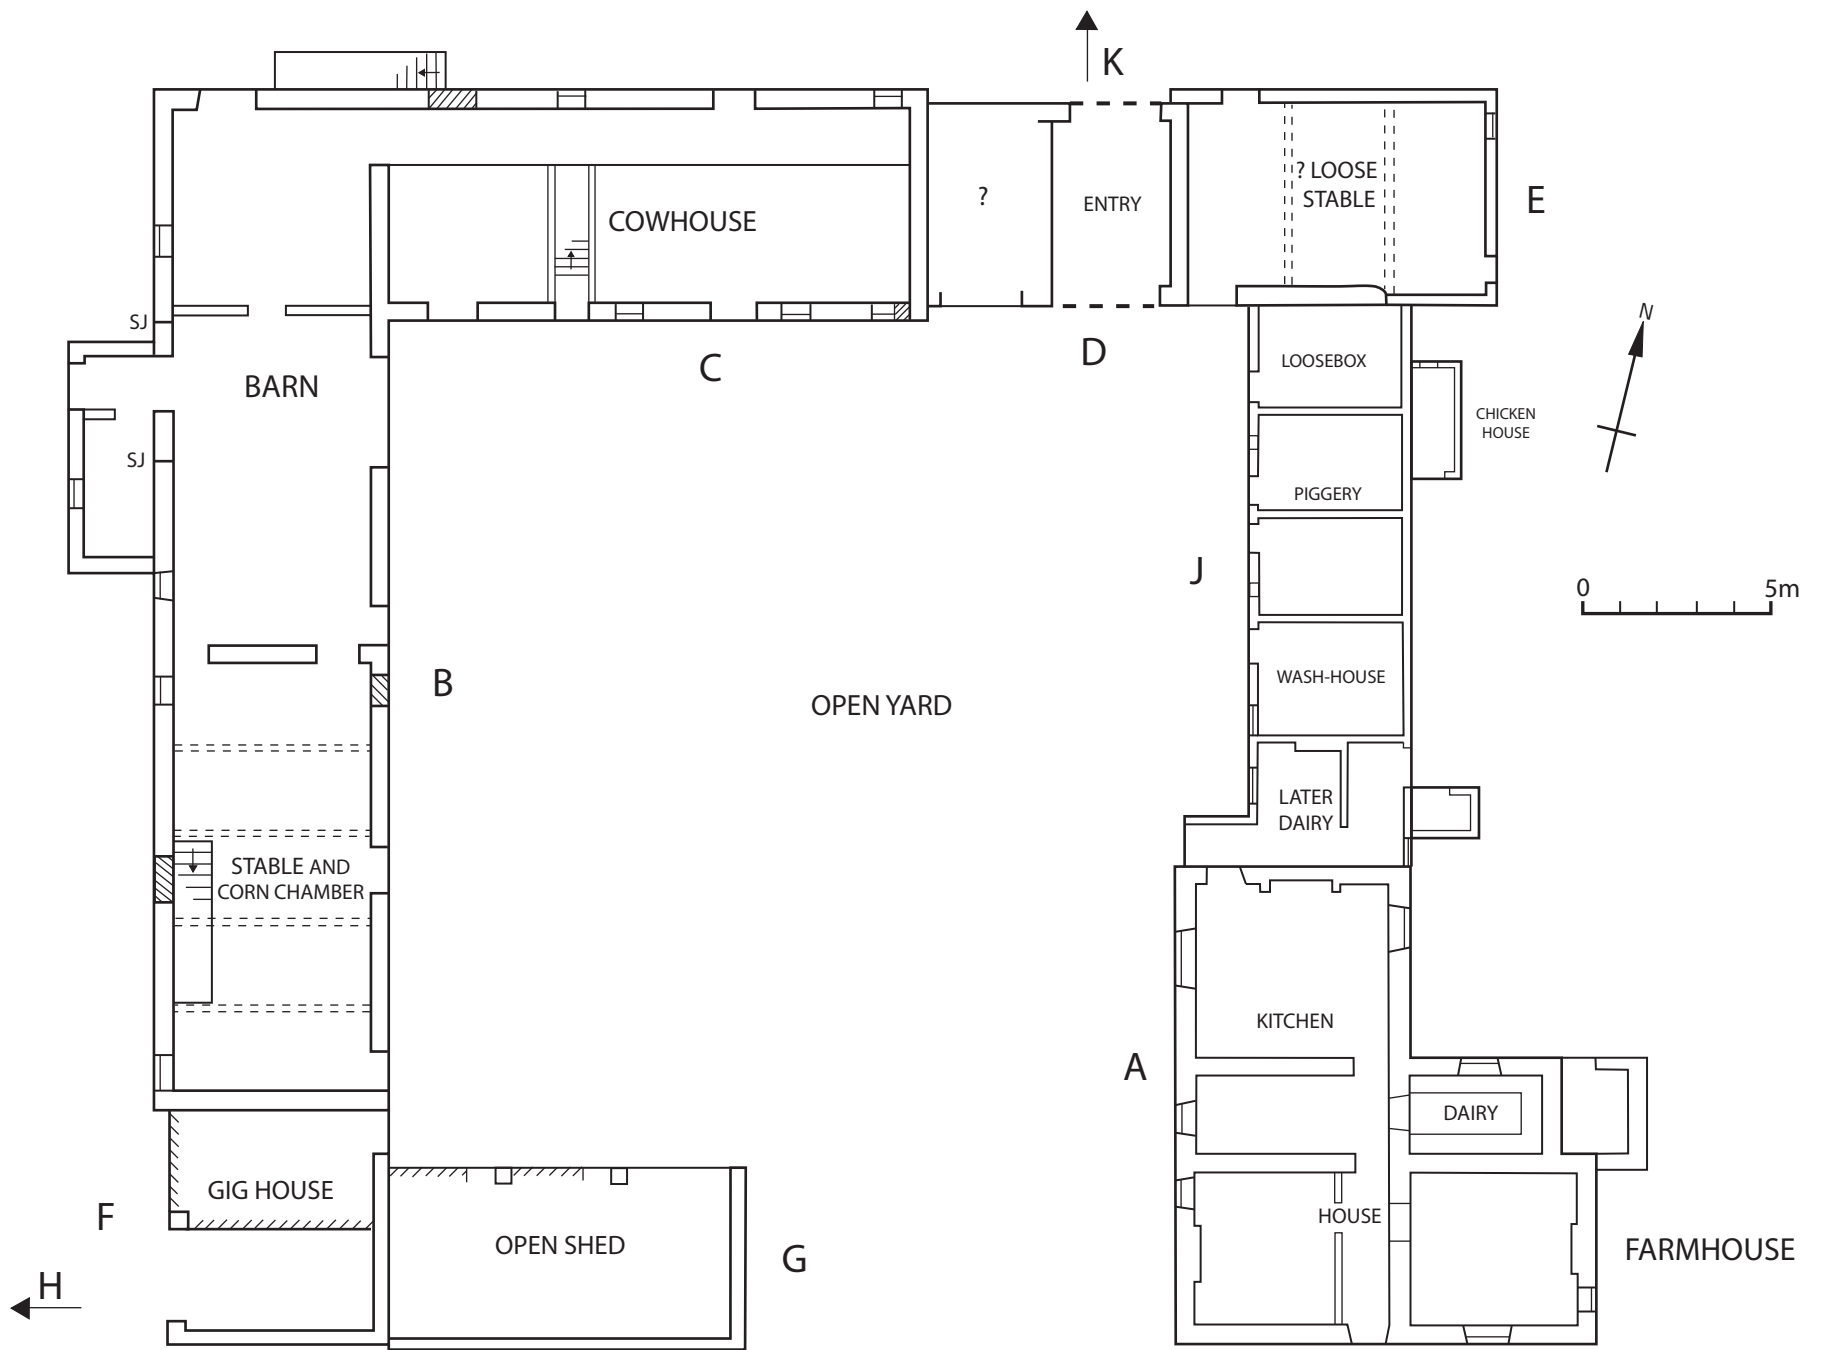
Ground plan of the main part of the farmstead at High House, Timber Lane.
